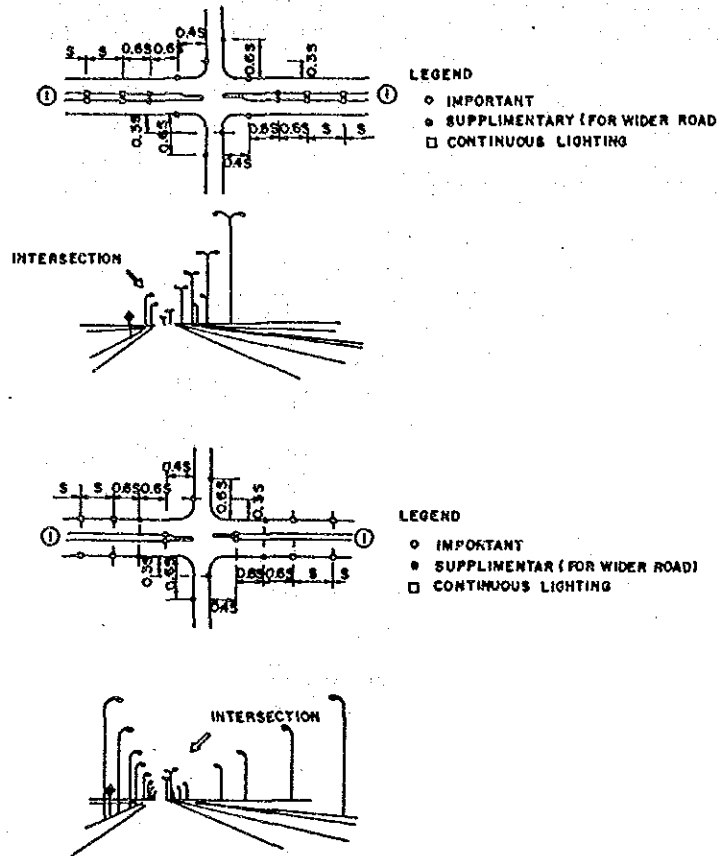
Typical Luminaire Arrangements (Indication of Intersection)
